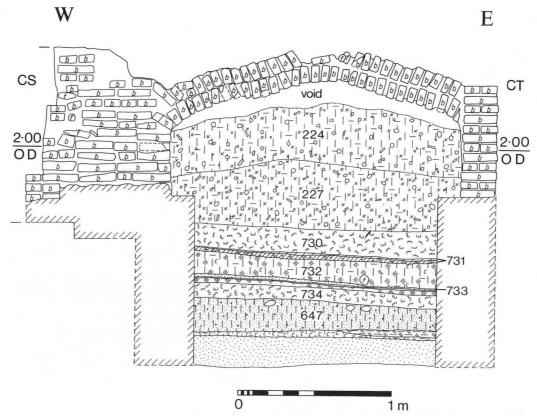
Phase III2 (east). Building 3132. Elevation of vault 187 (CS- CT). Elevation located on Fig. 42. Scale 1:25.
